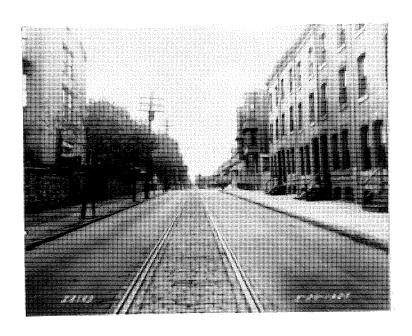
17. Looking east on Poplar Street from 23rd Street in May of 1927. Note the trolley tracks and street pavers. (Folder No. 1242, Philadelphia City Archives).
